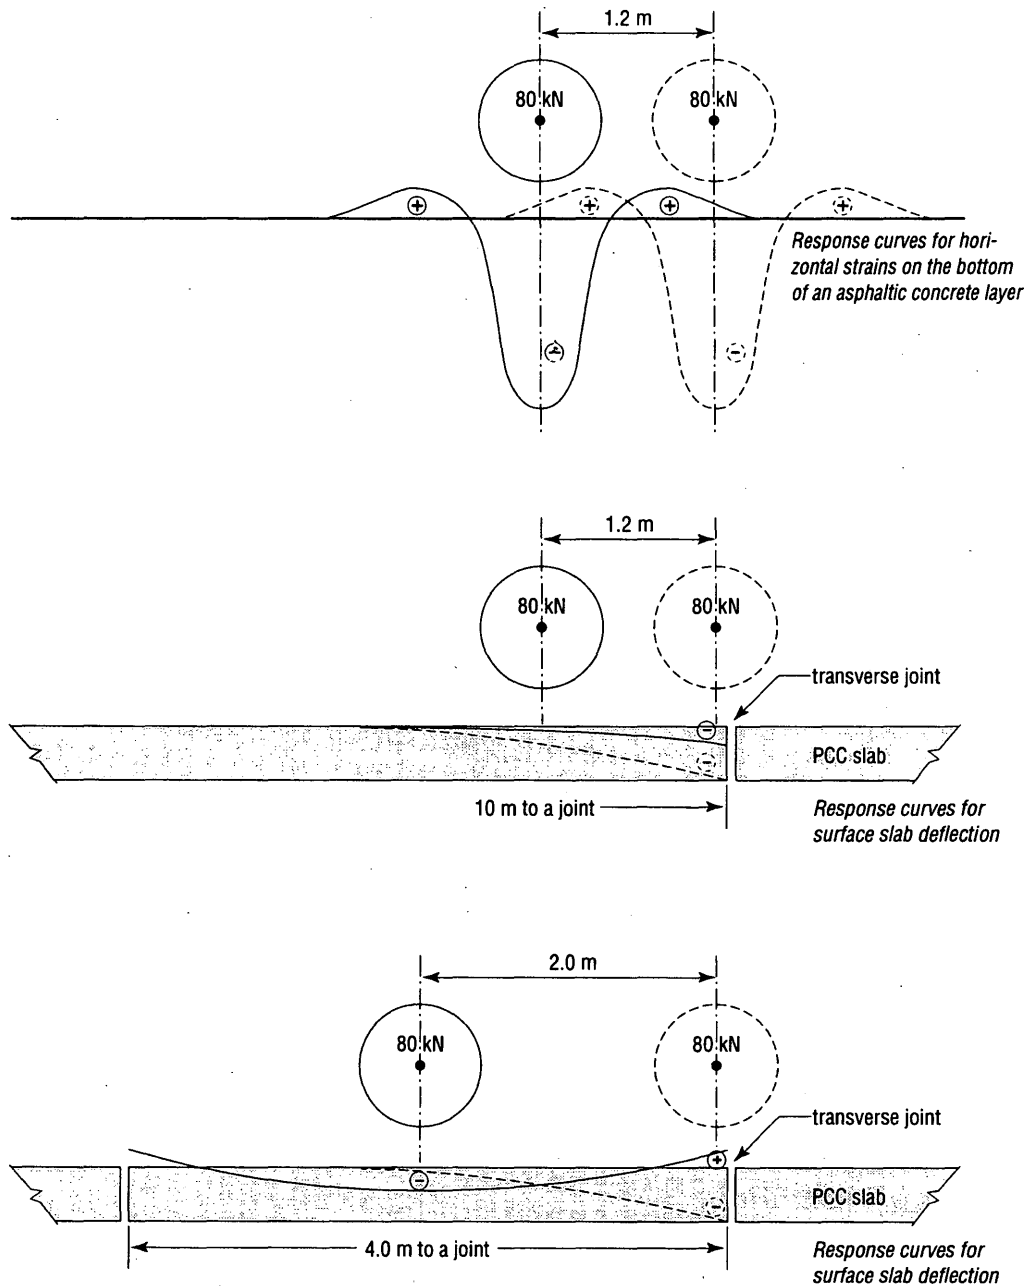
Response of asphaltic concrete pavement: short axle spacing (*top*); response of rigid pavement: short axle spacing, long slab length (*middle*) and large axle spacing, short slab length (*bottom*).
